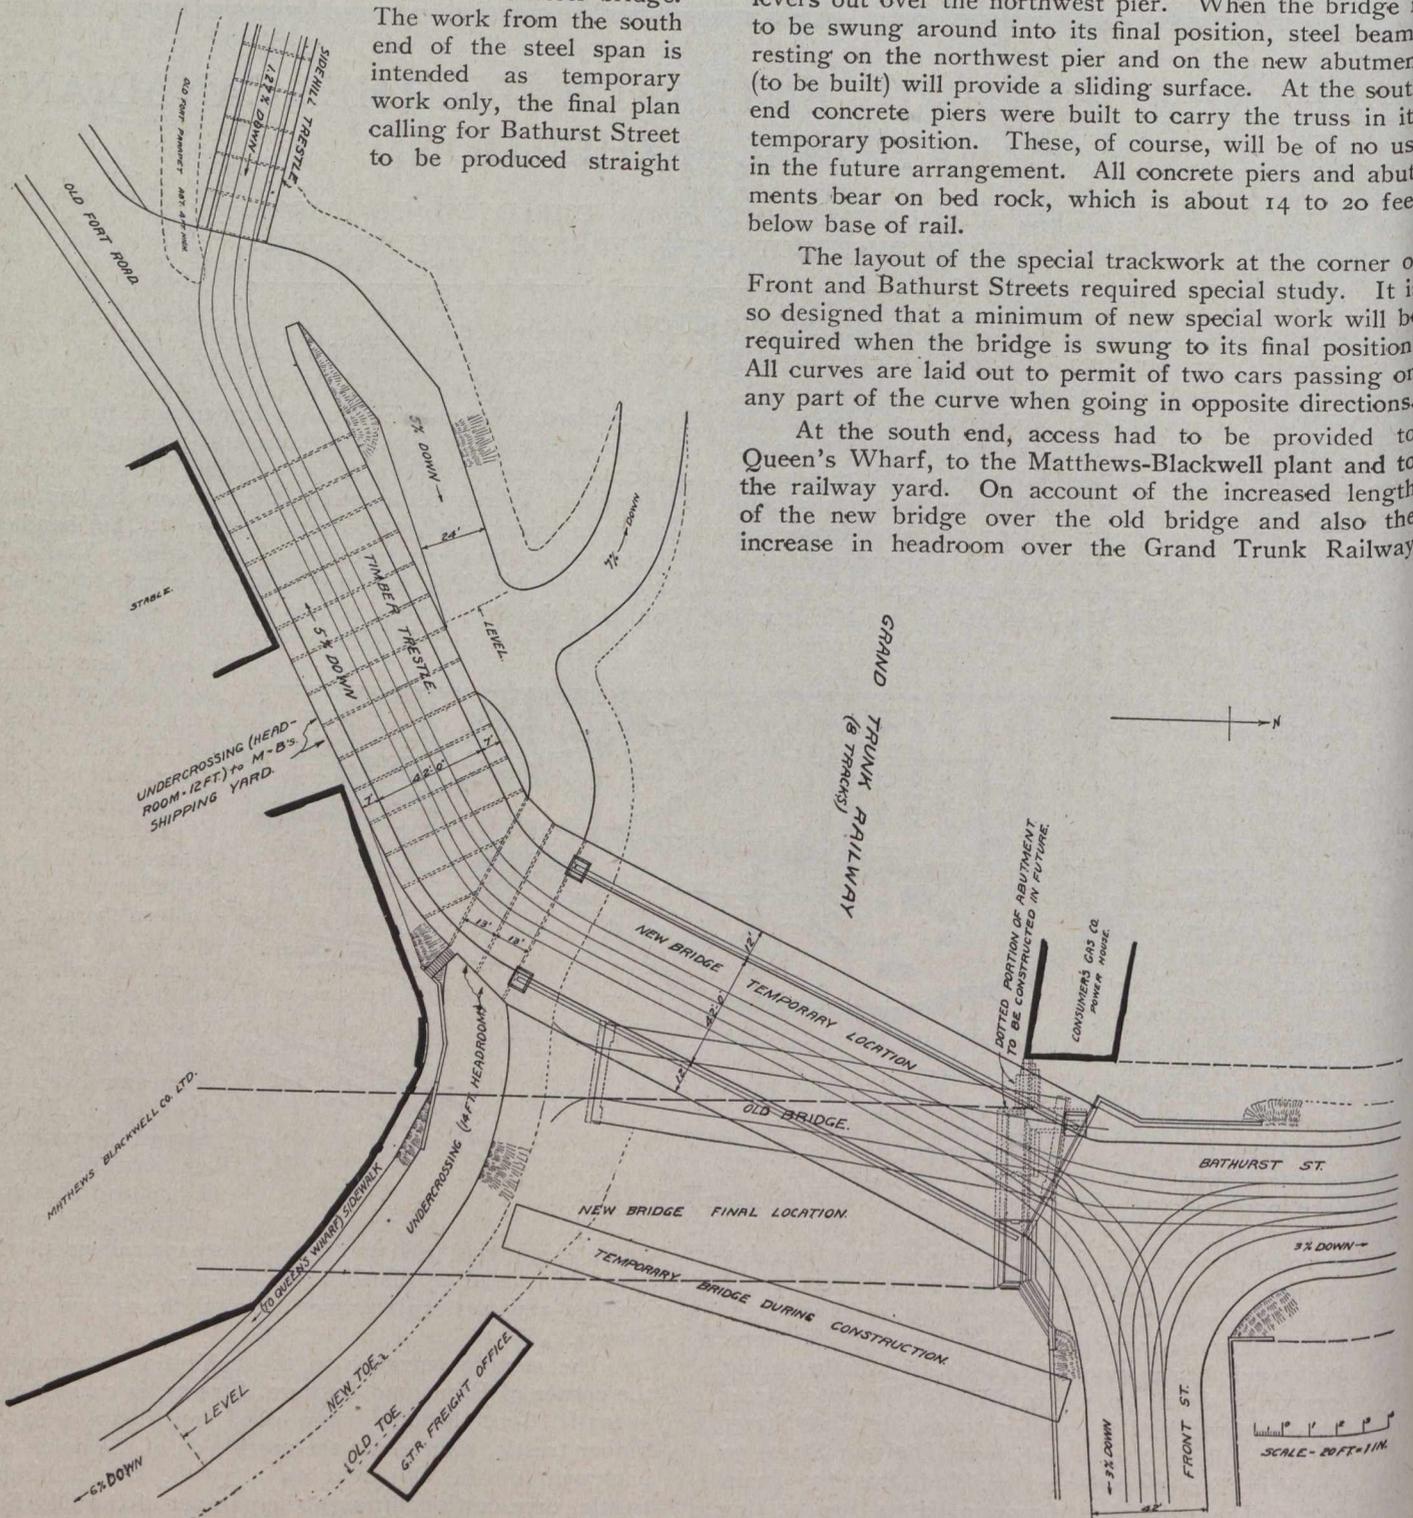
Plan of New Bathurst Street Bridge, Showing South Approaches.
